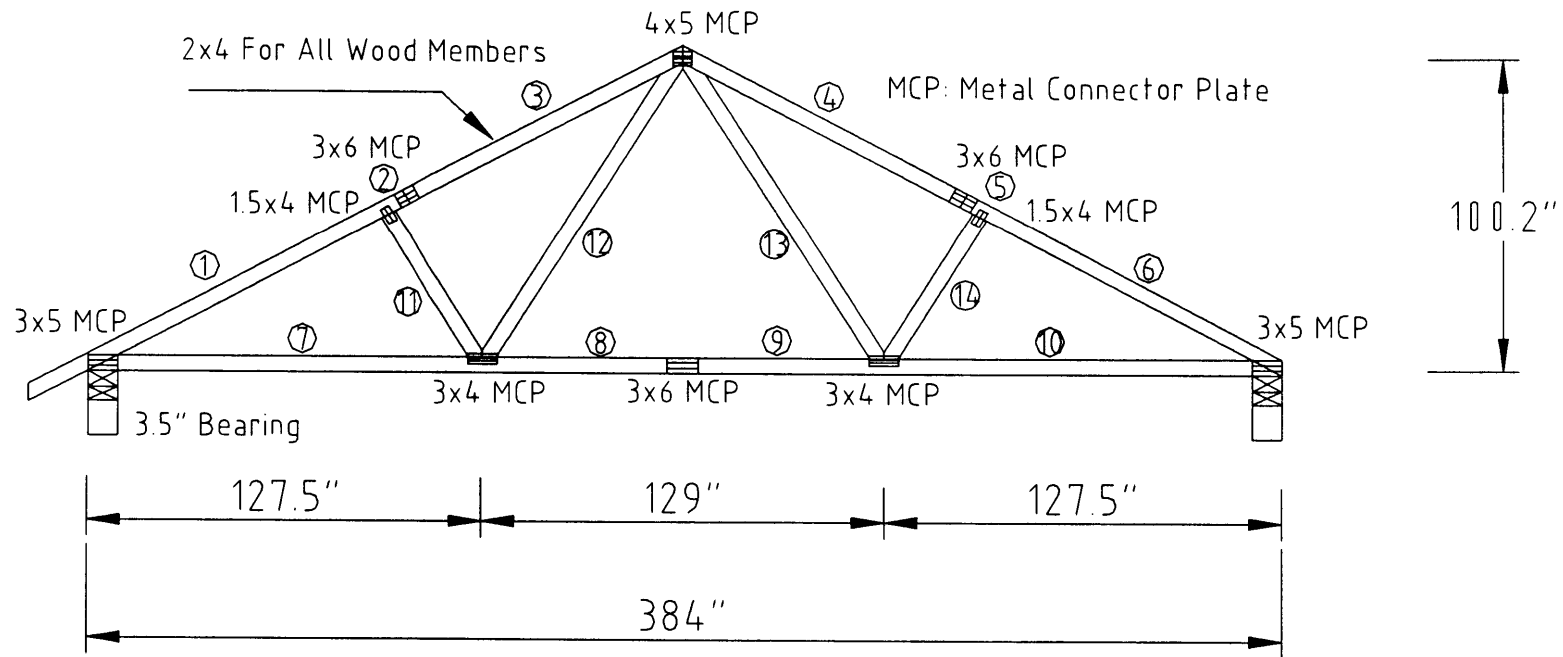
MPC Truss Type A1 from a Truss Plate Manufacturer
